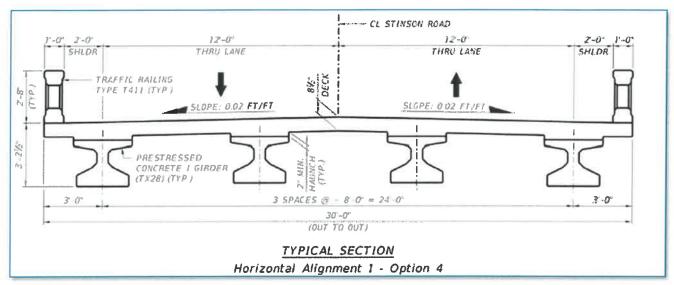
TxDOT Prestressed Concrete I-Girders (TX28) Typical Section
